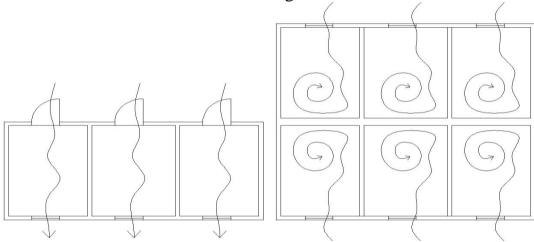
To the left, single banked house construction. To the right, double banked house construction
